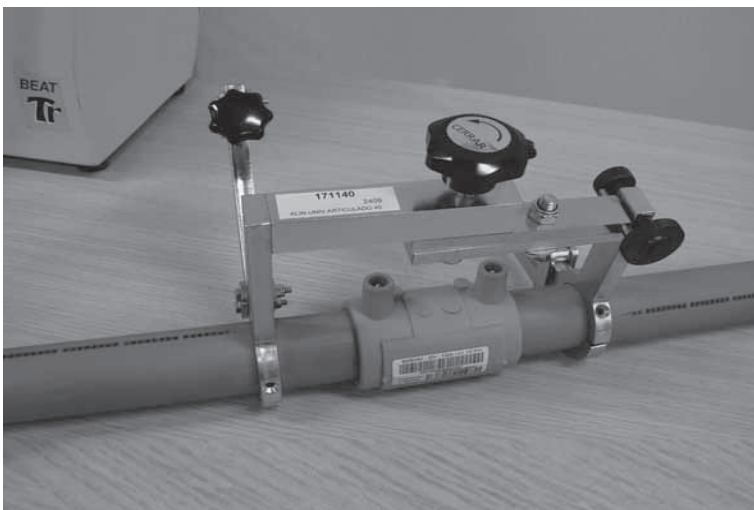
Align the pipes and the electrofusion socket by using a suitable aligning tool.
